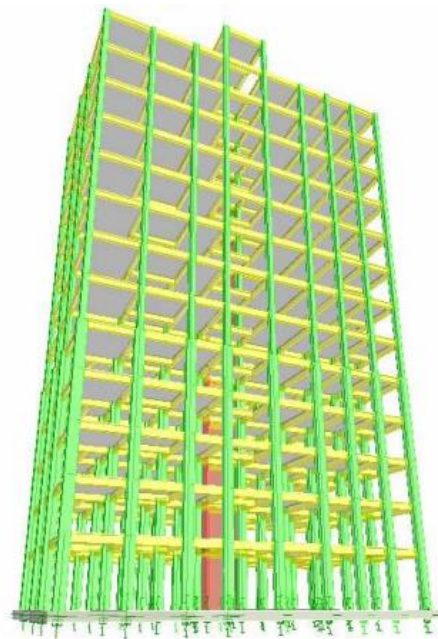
3D rendering view of building with raft foundation and applied soil springs in ETABS
